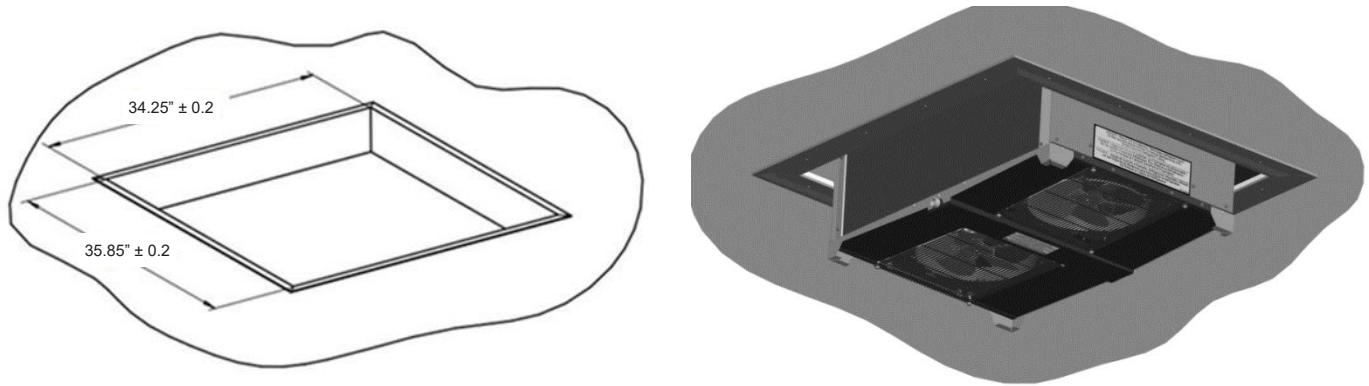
Installation opening dimensions (inches) and TRIM assembling suggestion
